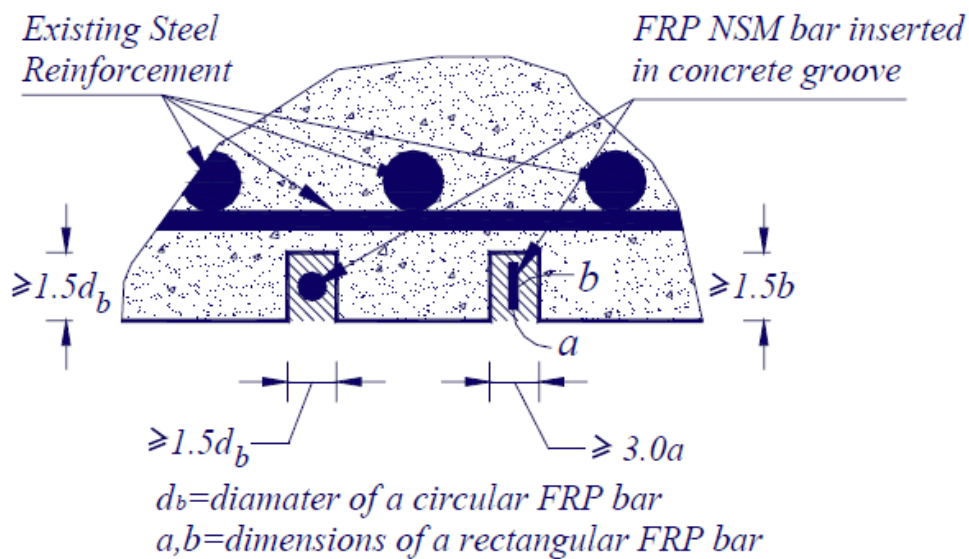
Near-surface mounting detailing, courtesy of Casadei, 2006
